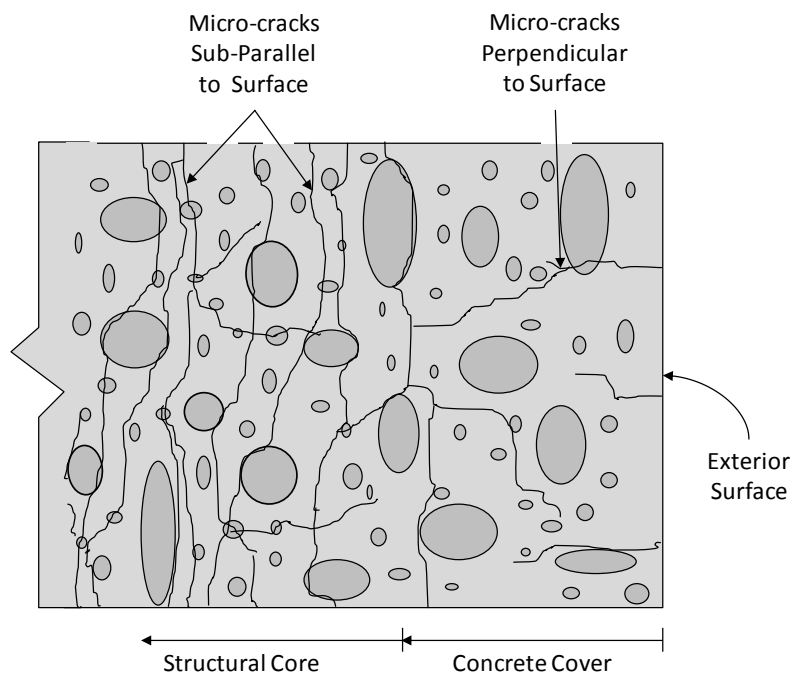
General Crack Orientation within Cores from First Series Specimens
